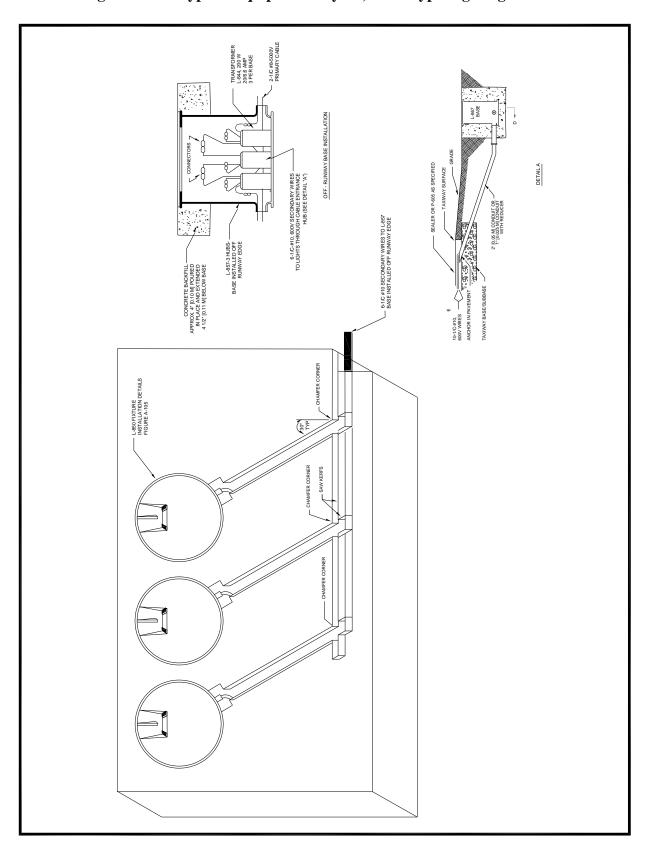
Typical Equipment Layout, Inset Type Lighting Fixtures
